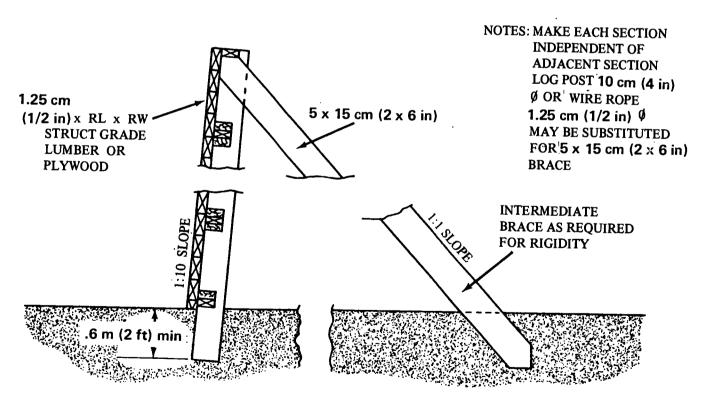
Standoff construction, dimensioned timber—condition III.
